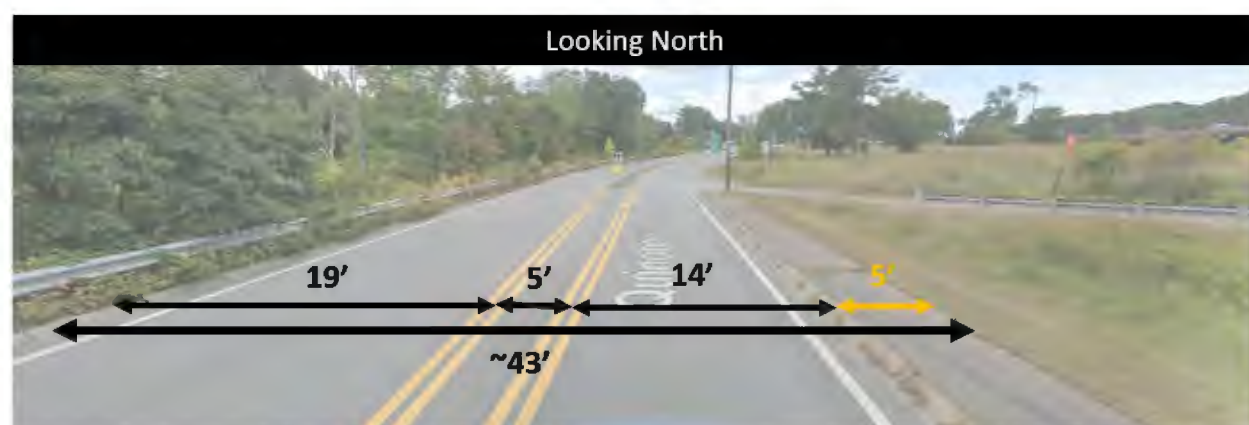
Existing Conditions – Quinobequin Road North of I-95 SB On-Ramp (Location 5)
